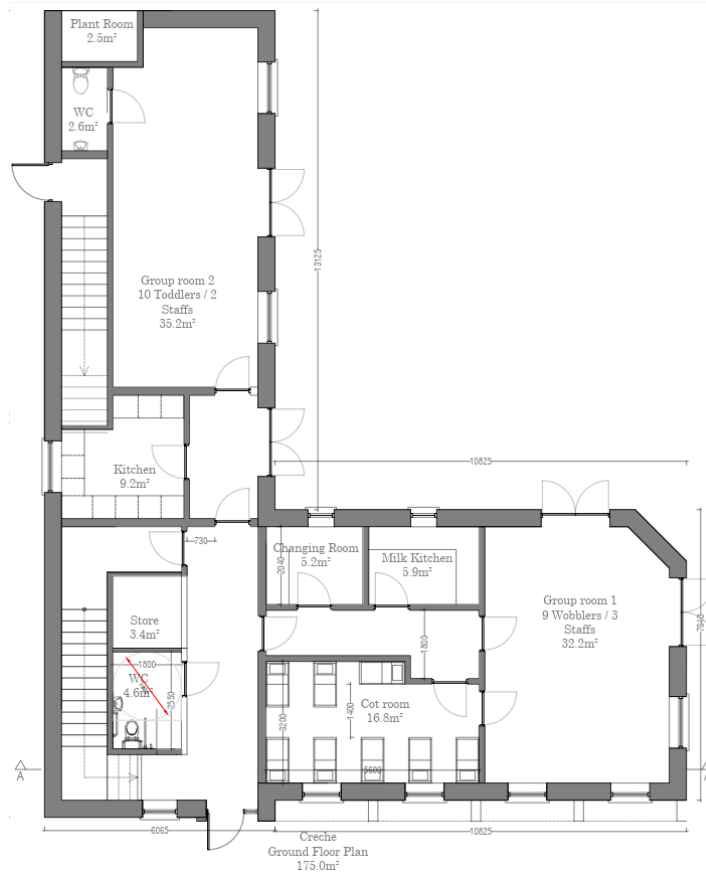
& 3: Floor plans extracted from JFOC Architects Drawing No. 22.127.PD5101
